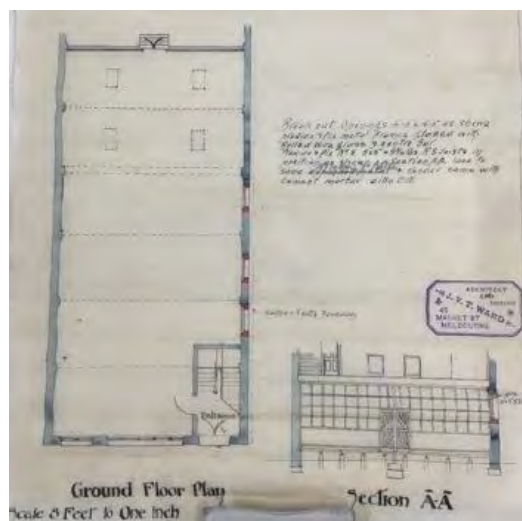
Building application plans from 1916 showing three proposed openings at northern elevation. (Source: PROV VPRS 11200/92 unit 6, item 267)
